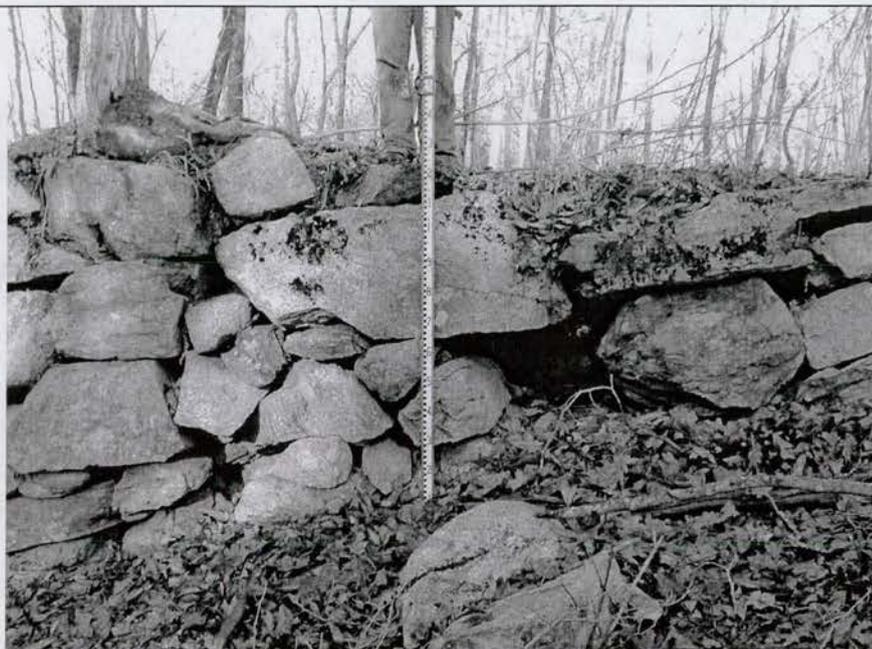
3-12-1-2005 London Bridge E wall North to South, Section 3 View W
